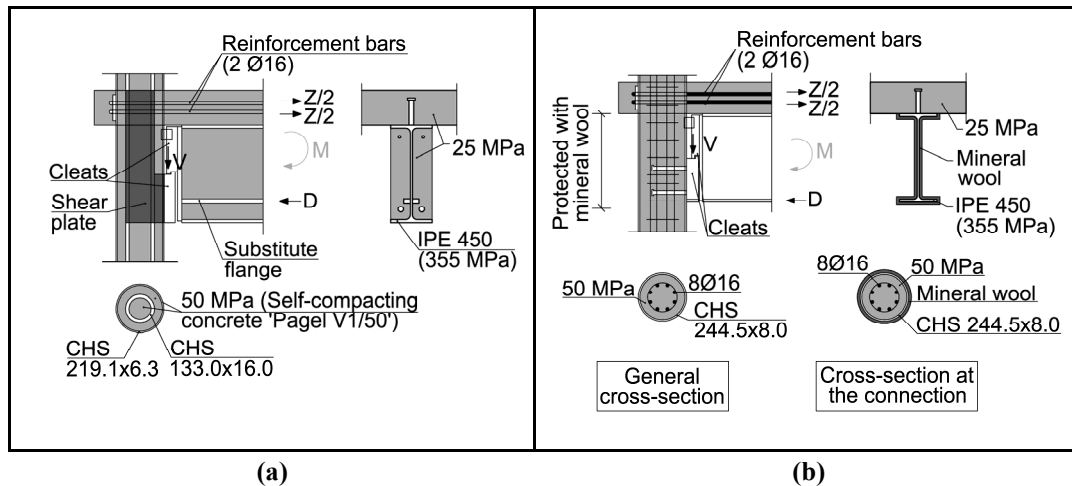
Design drawing of composite joint with concrete-filled double skin steel tubular (CFDST) columns (a) and of protected composite joint with concrete-filled steel tubular (CFST) columns (b).
